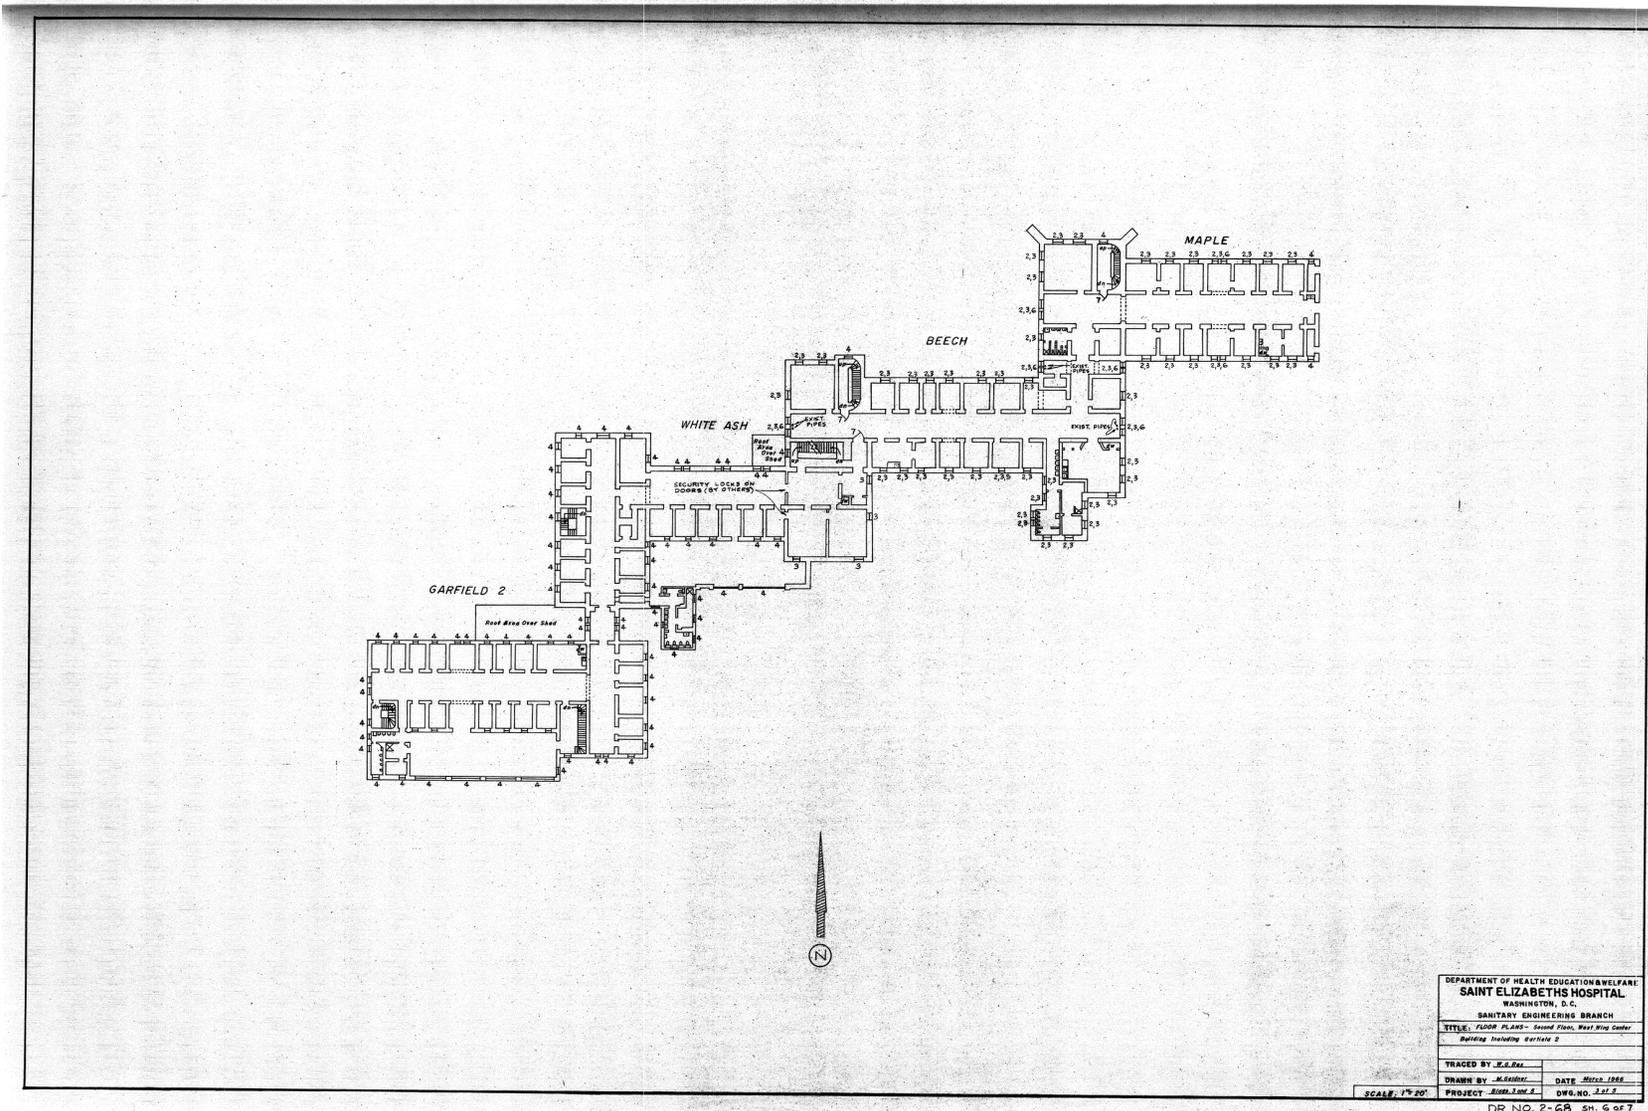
Second floor plan of the West Wing, Beech and White Ash wards, 1966. Source: GSA archives, image DC0070SE0109.
